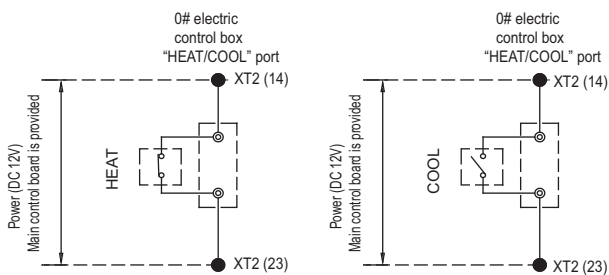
Wiring of "HEAT/COOL" weak electric port
